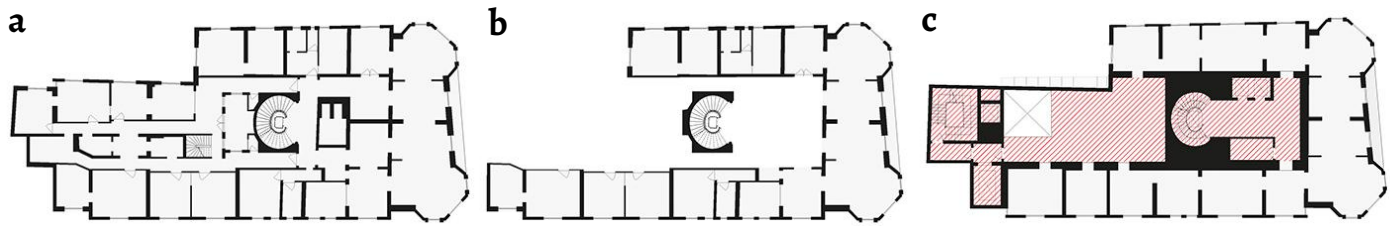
Adaptive reuse strategy of the museum: *a)* existing situation of the plan layout; *b)* protected shell and the staircase of the old building; *c)* new technical core addition (red area) [31].
